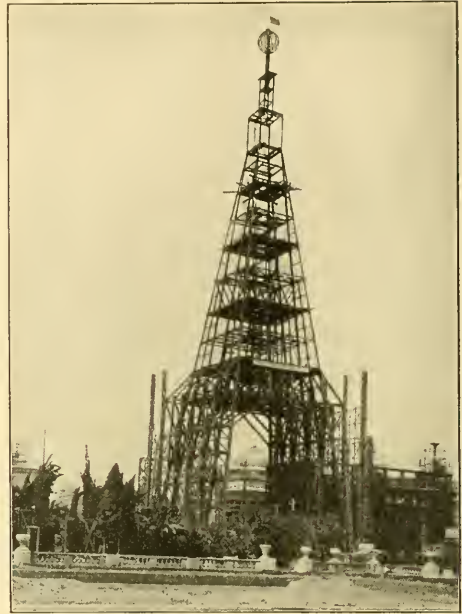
COMPLETED STEEL FRAME, TOWER OF JEWELS
